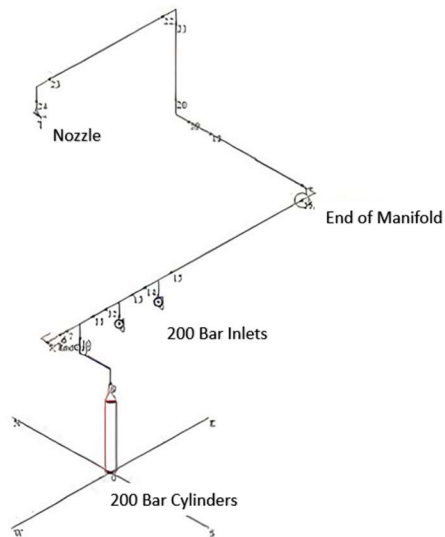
Kidde designed full-scale tank and pipe layout with specifications.
